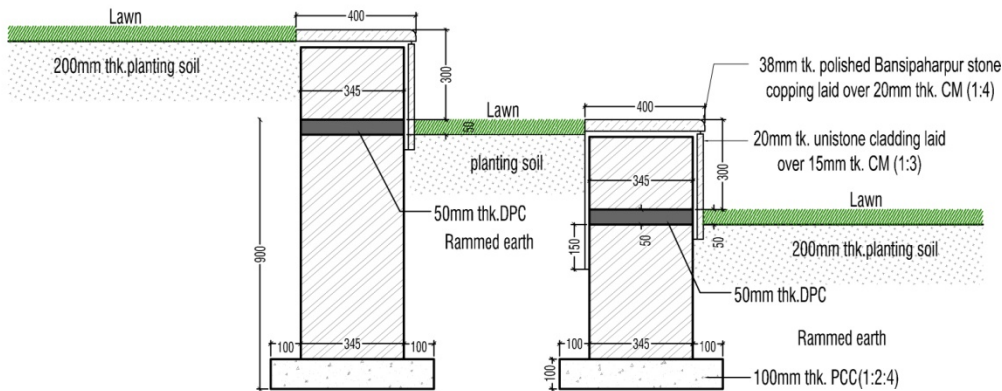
Typical Detail B of Seating in Open air Theatre
